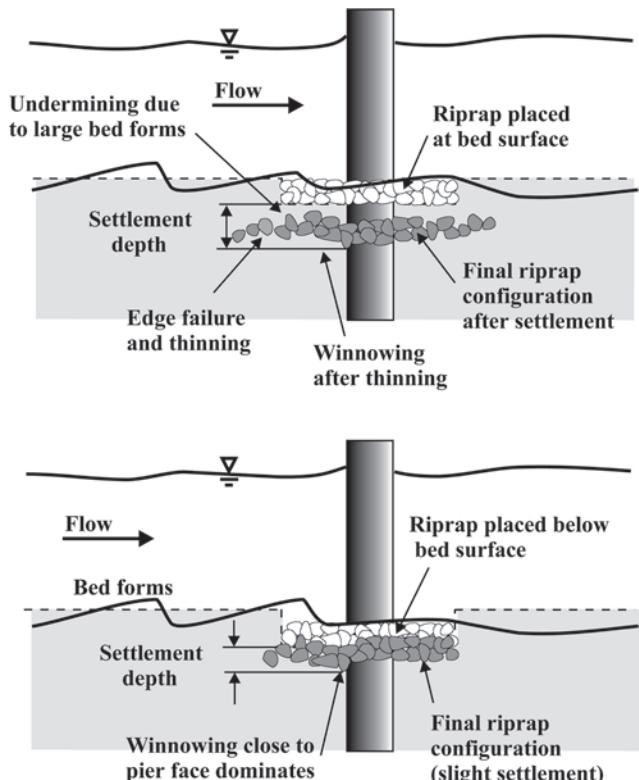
Failure mechanisms for riprap protection at bridge piers (after Melville and Coleman 2000).
